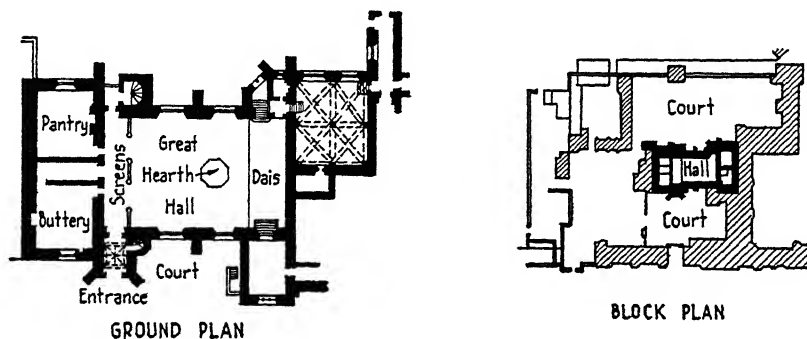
PLAN, PENSURST PLACE, KENT (1388)
